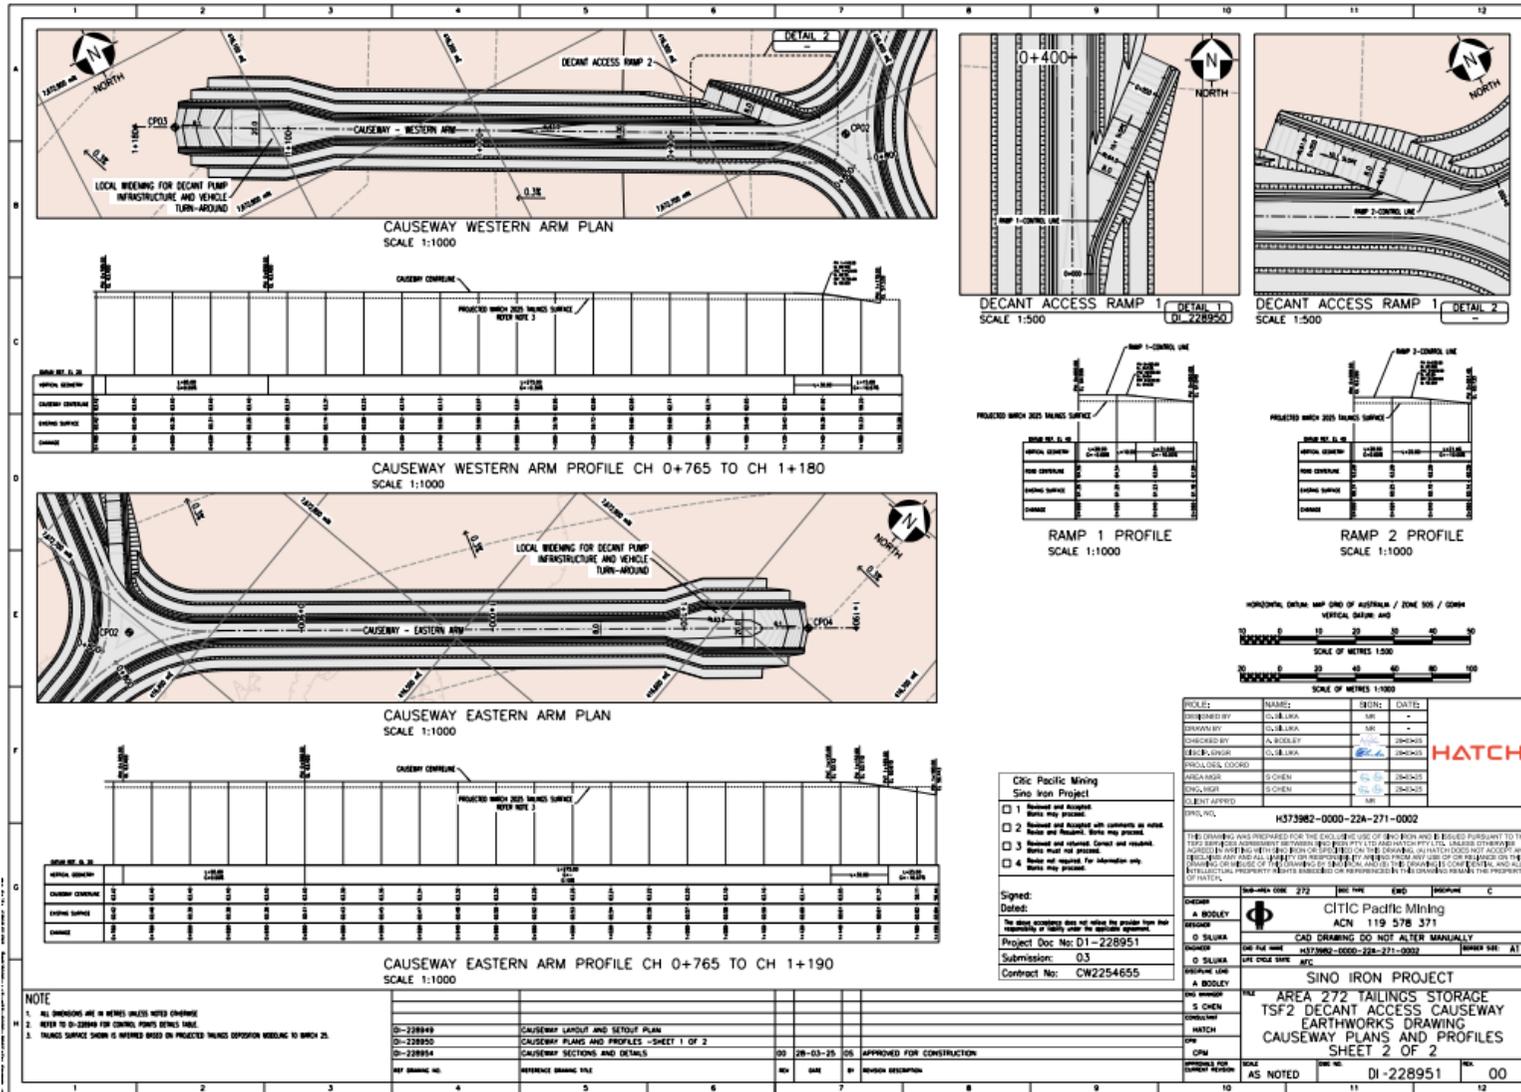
TSF2 Causeway Plans - Eastern and Profiles - Sheet 2 of 2
